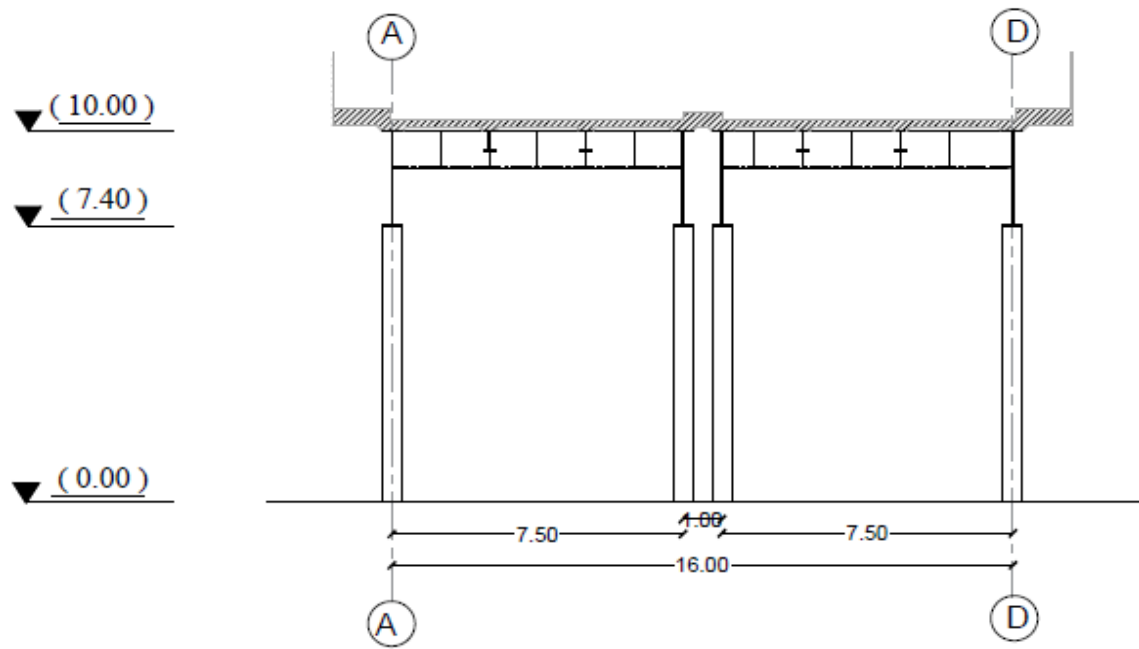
6 Layout of deck part plan, side view & elevation (second trial)
